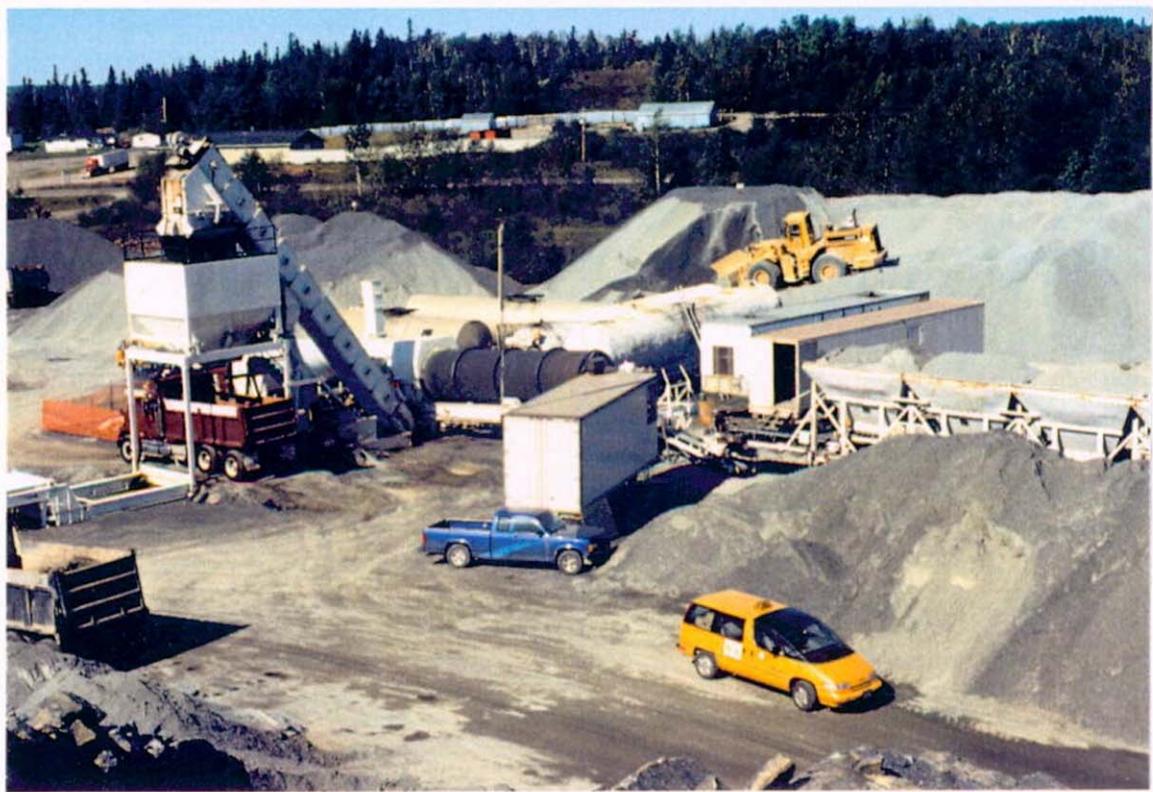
MTQ # 125 Boeing MS100 four bin portable drum mix asphalt plant at Larouche, QE.
